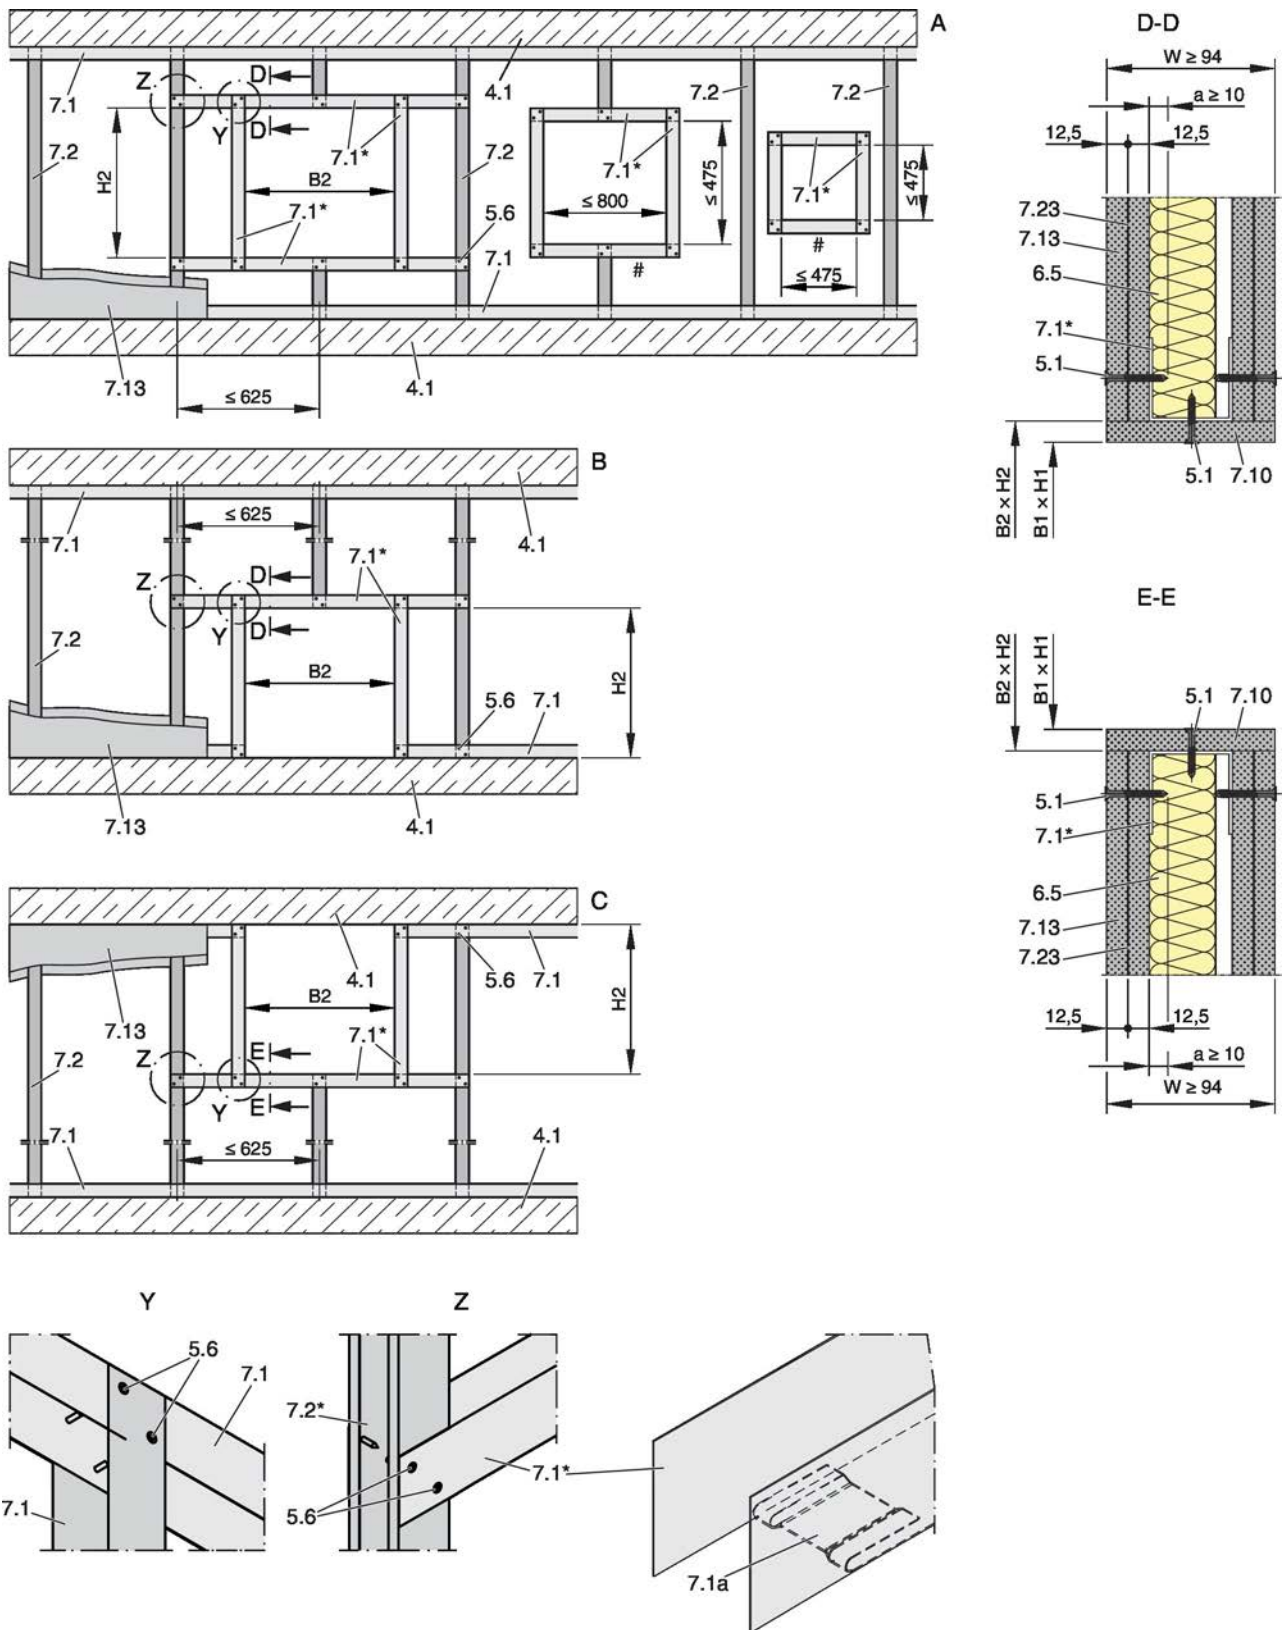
Lightweight partition wall with metal support structure and cladding on both sides
